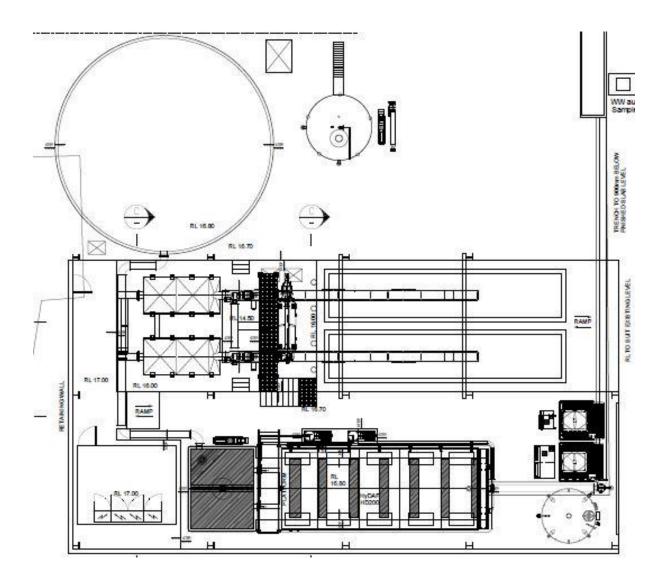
Planned layout of upgraded wastewater treatment system for installation mid-2018.
